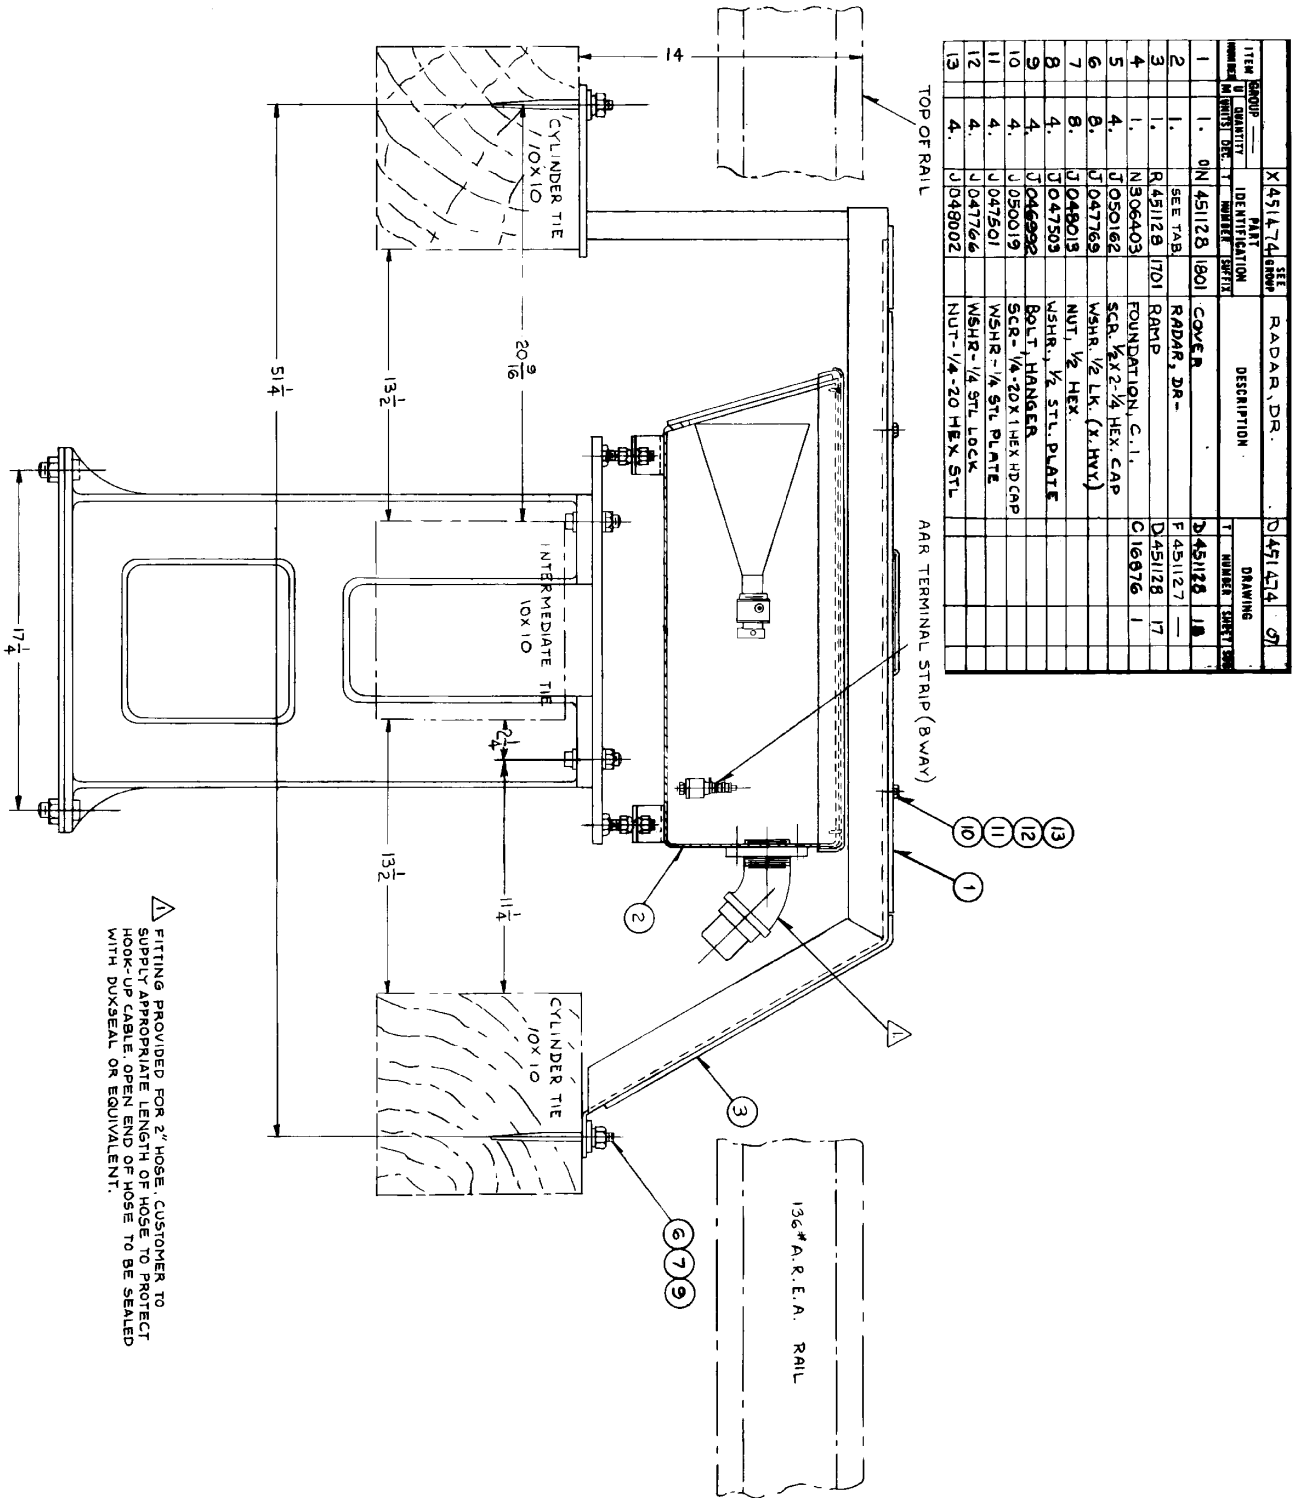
(a). DR-50 Radar, Application Between Rails, (Single Pylon) Ballast Foundation
